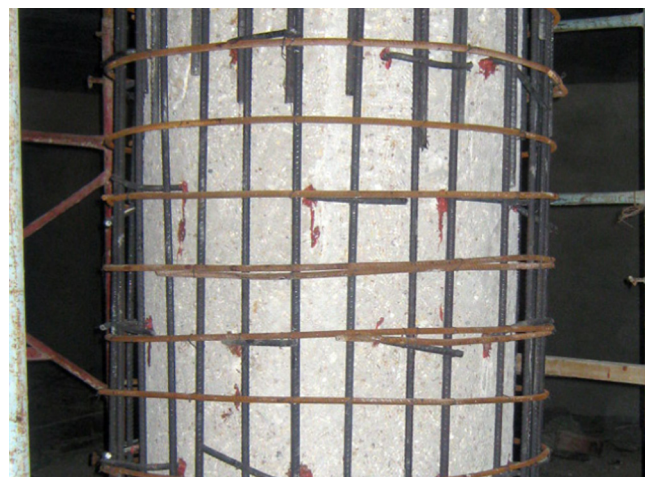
Installation of dowel bars and new steel cage for concreting (Source: www.coreandcut.com [12]).
